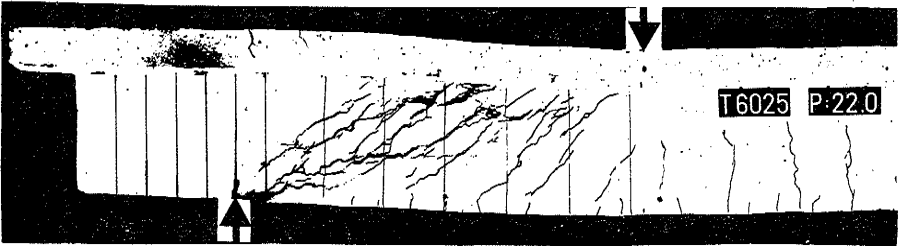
Shear failure of beam with web reinforcement (BRÆSTRUP et al. [6]).
